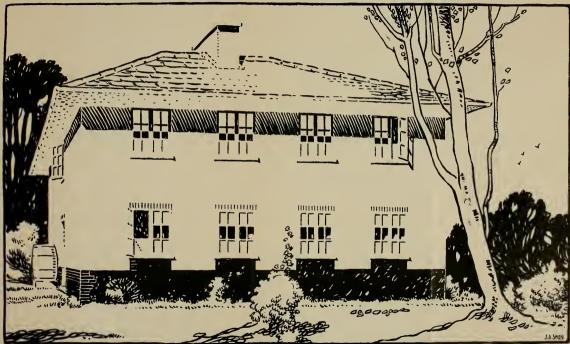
ELEVATION OF COTTAGE DESIGNED BY MR. ARNOLD MITCHELL.
